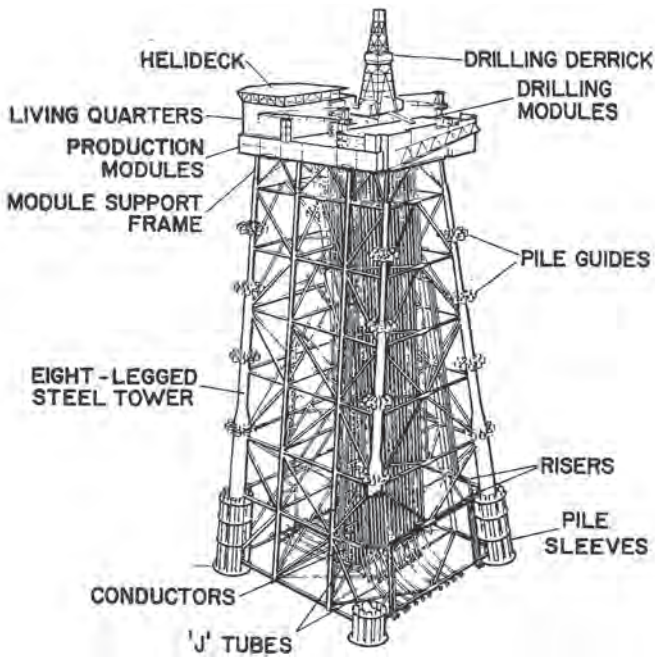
Example of a tower structure with skirt piles clustered around the corner legs
